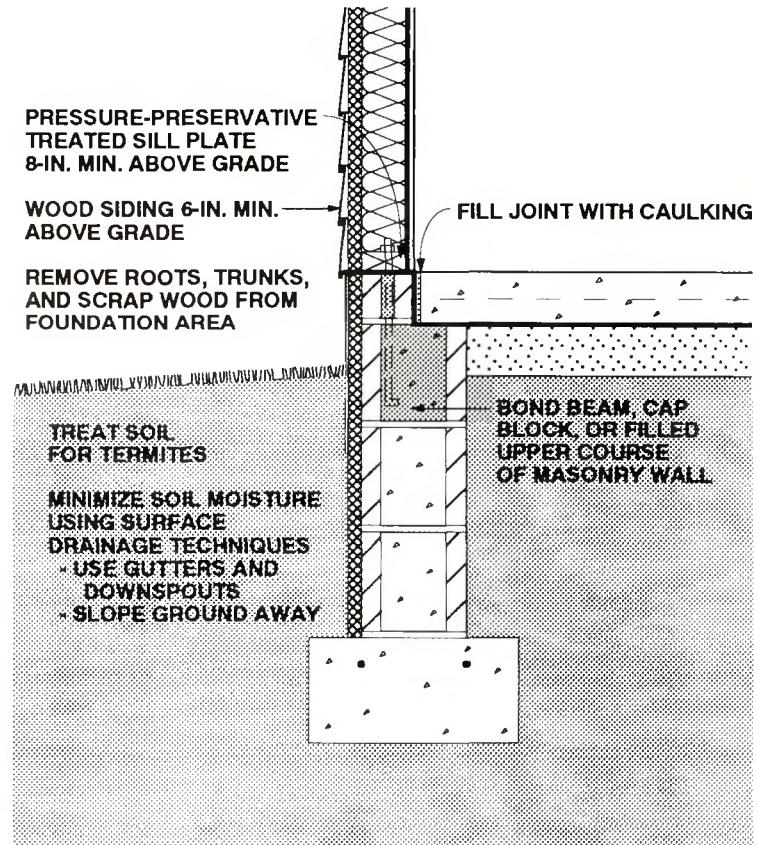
Termite Control Techniques for Slab-on-Grade Foundations
